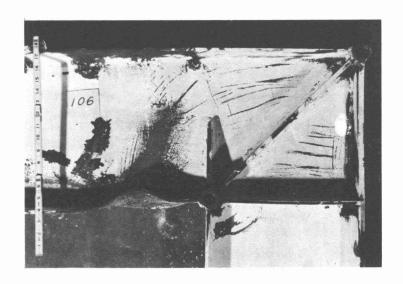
MODE OF FAILURE OF 14WF30 CONNECTION. LOCAL BUCKLING OCCURRED SHORTLY AFTER GENERAL YIELDING, AND WAS CAUSE OF FAILURE
